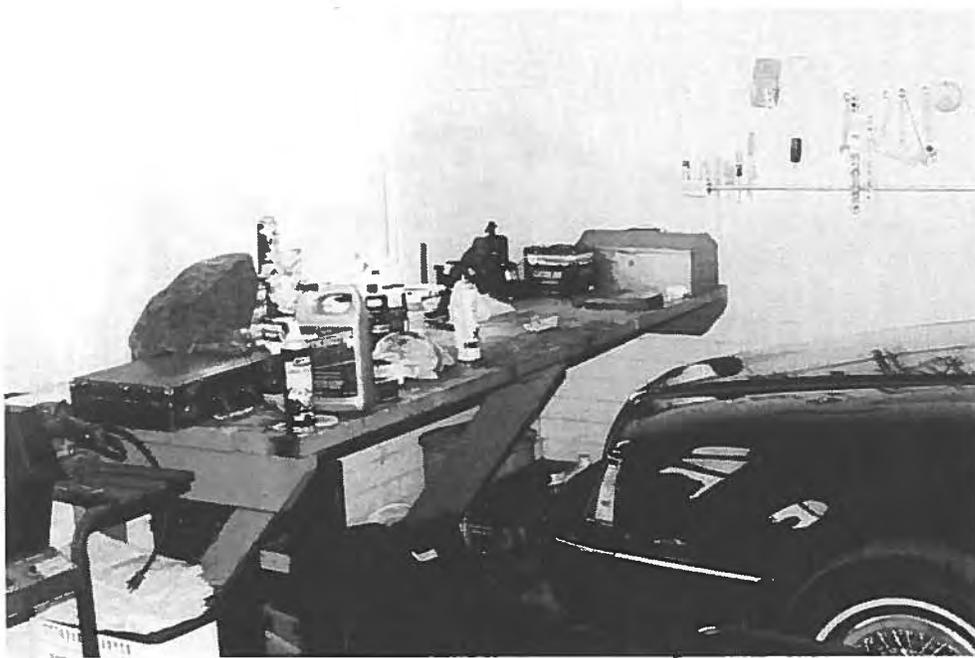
Interior of garage. Note the built-in workbench and tongue-and-groove interior siding.
